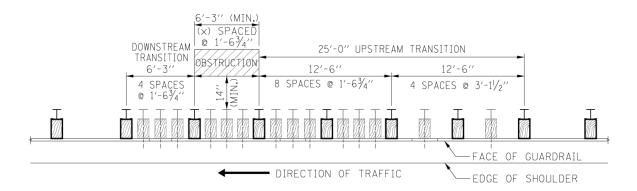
Guardrail Post Spacing Transition to ¹/₄-Post Spacing
